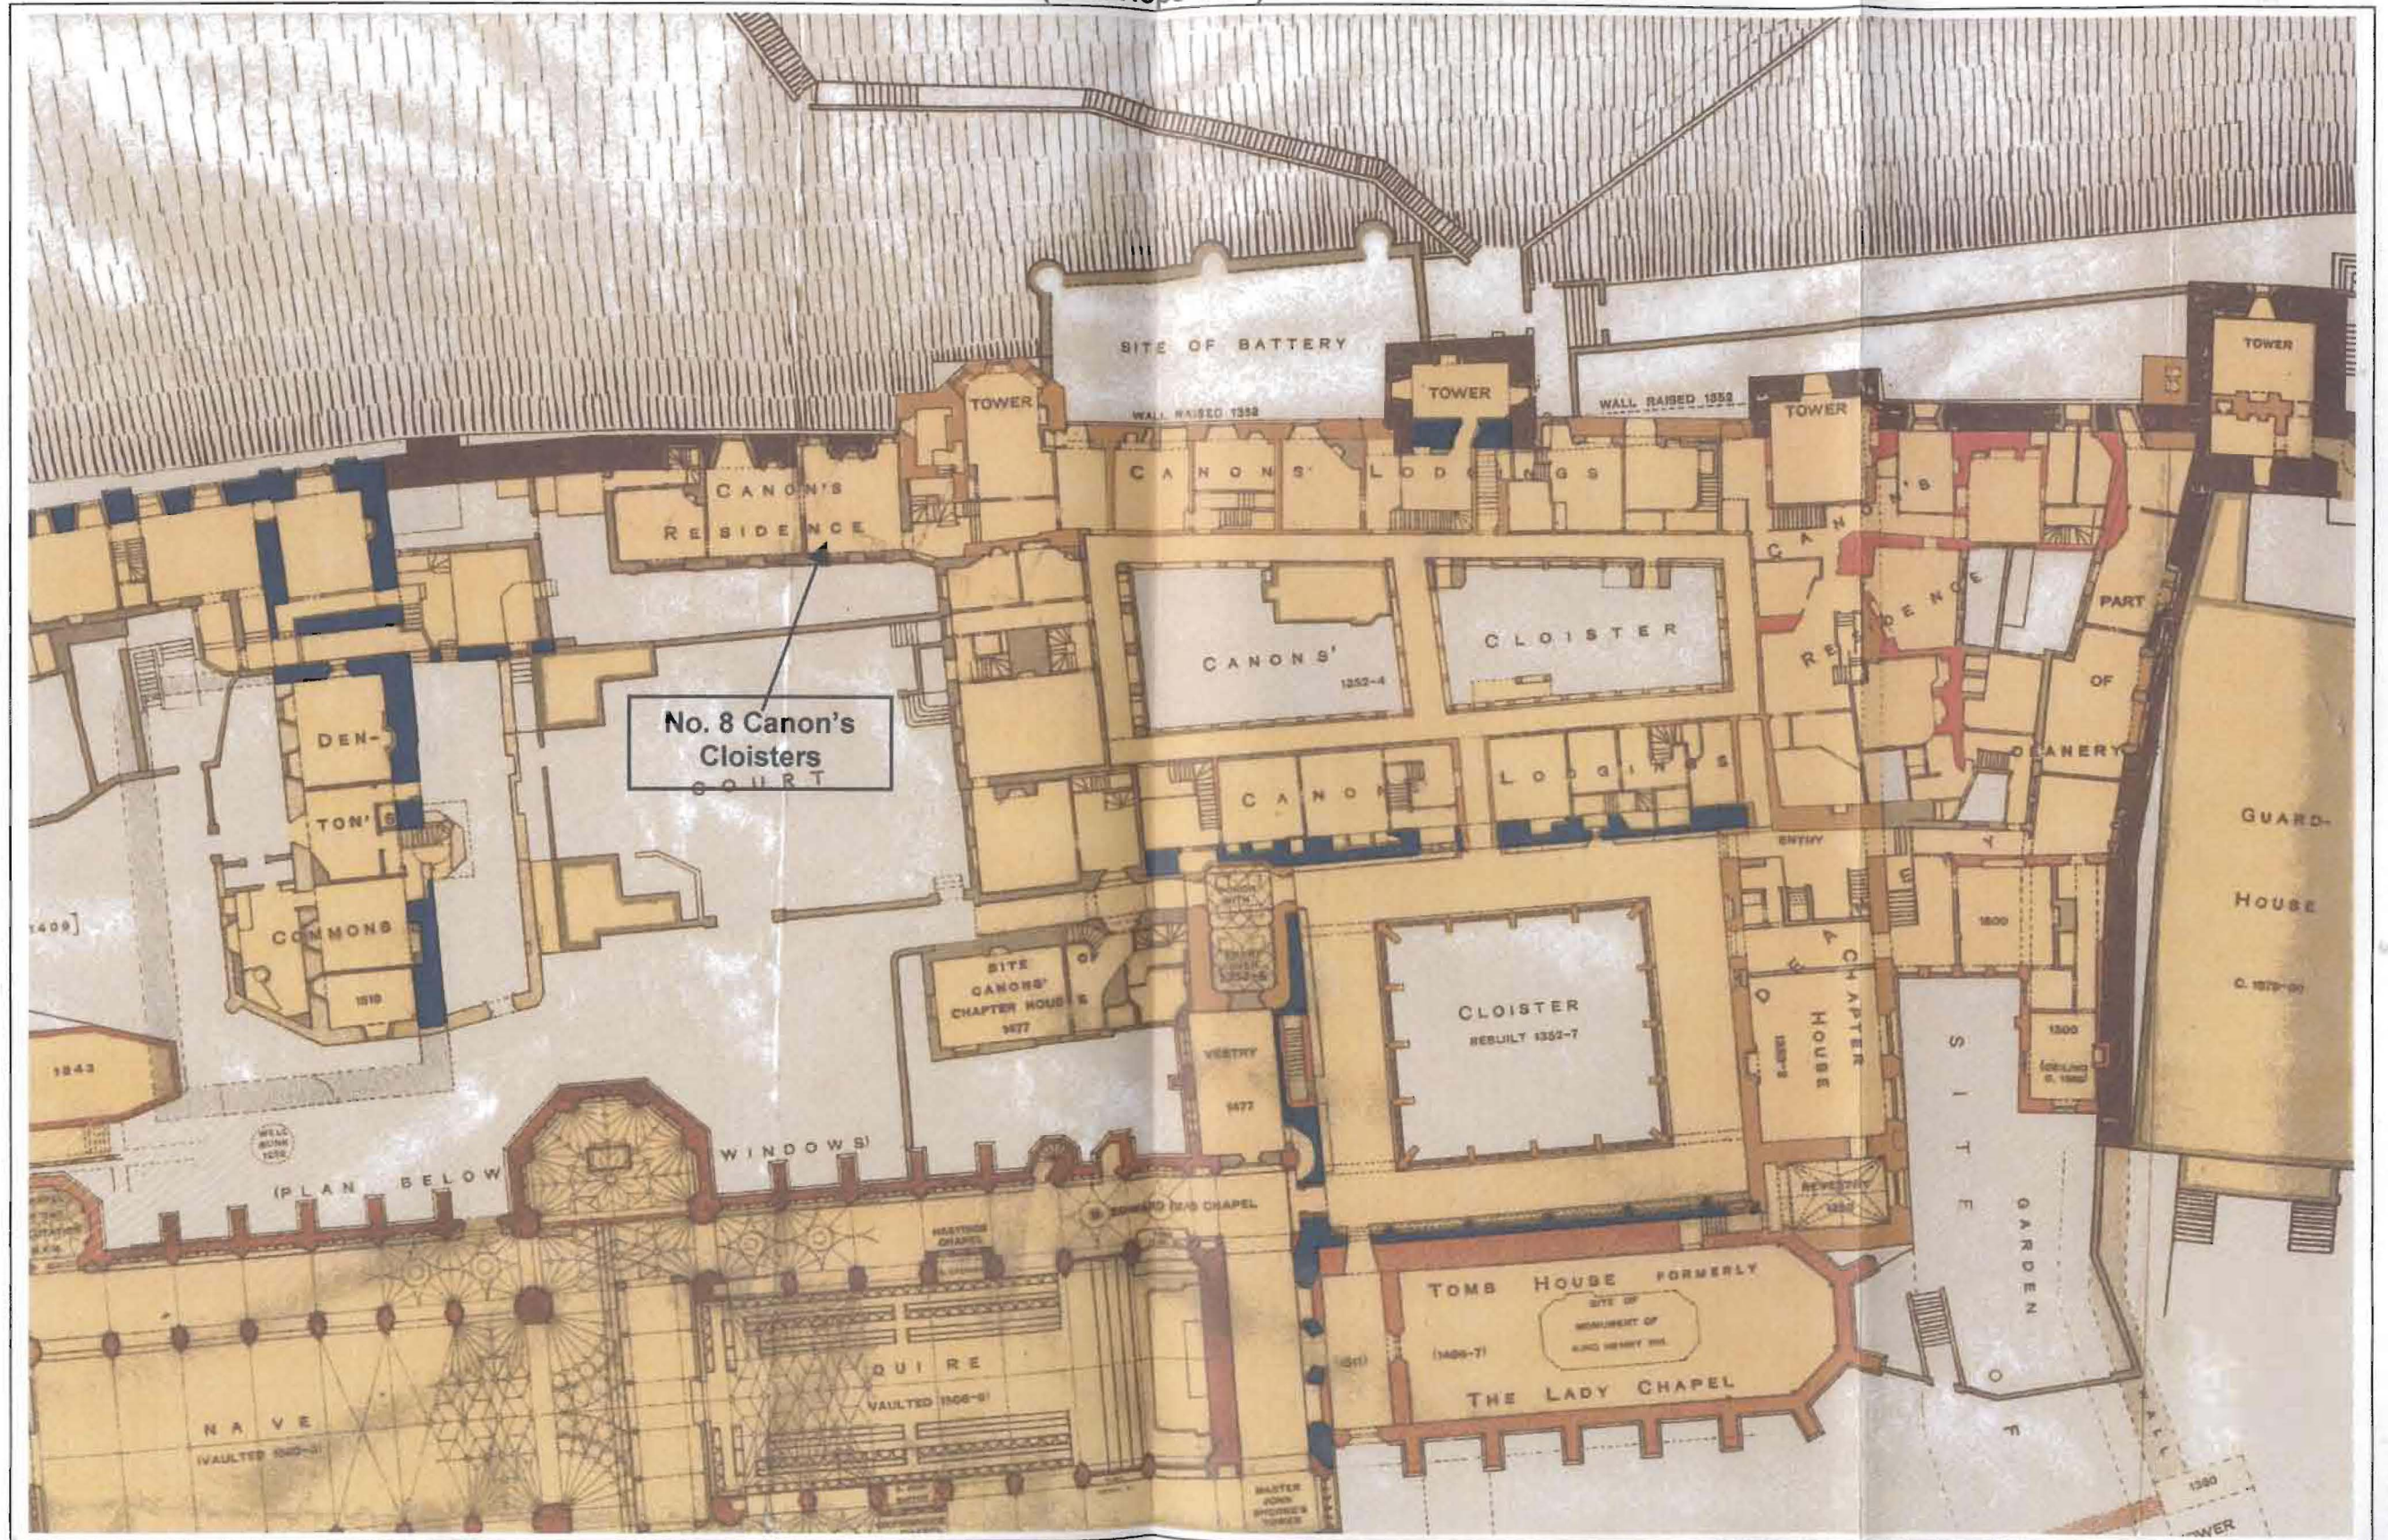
Drawing to show location of beams and floor within number 8 Canon's Cloisters (after Howard Jones)
